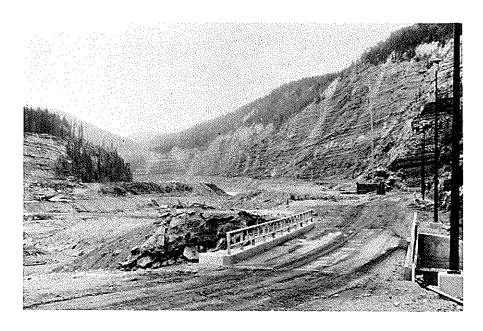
Gething Formation viewed from toe of Bennett Dam looking downstream toward Gething Creek.
